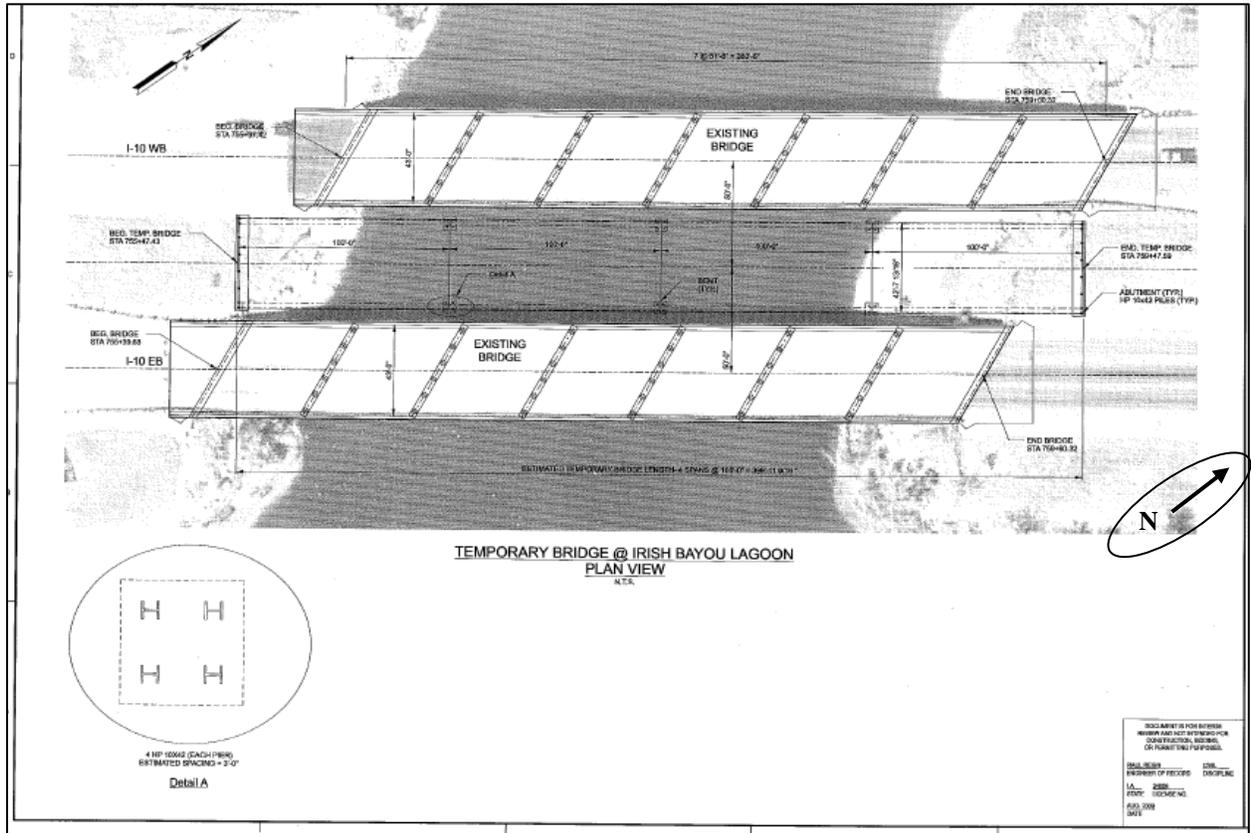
Construction plan view of the temporary traffic control bridge and detail for placement of H-piles.
